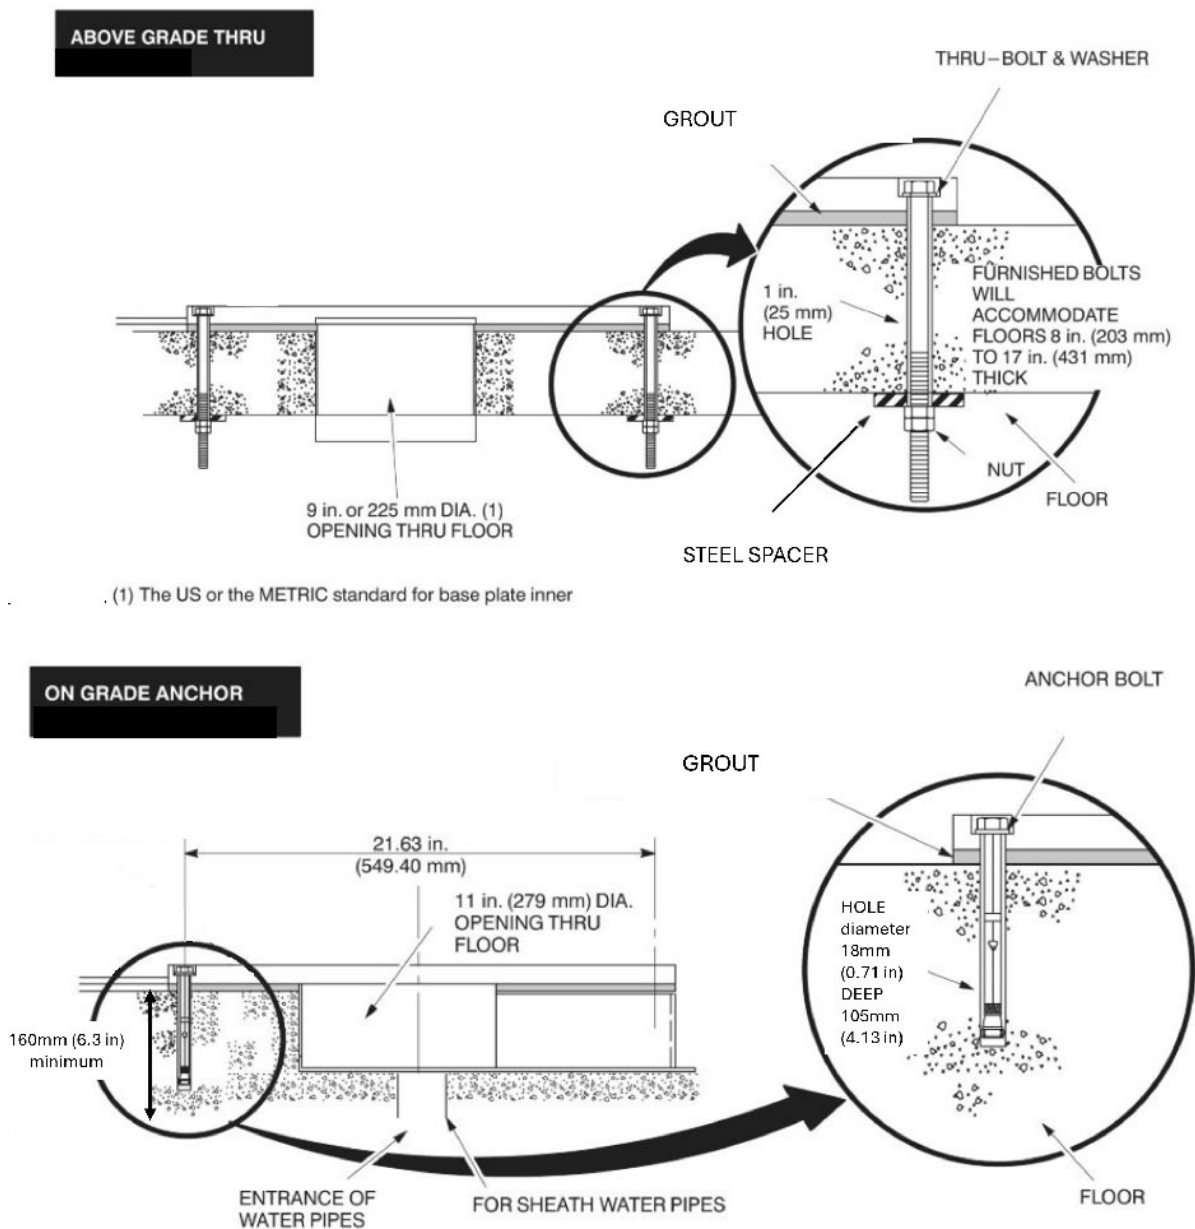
Gantry Floor Mounting Methods (2/2)
